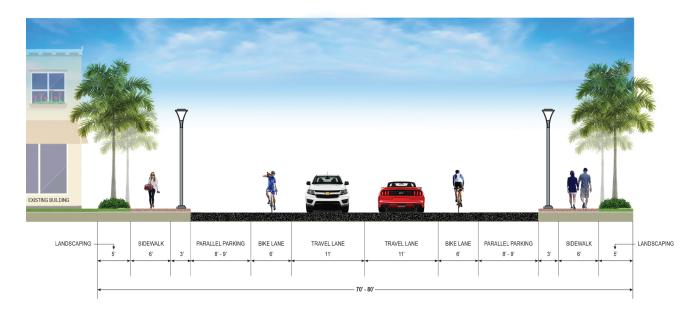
Proposed Street Sections. Note: These sections are meant as general design guidance; changes may be required upon more detailed design and engineering evaluations.
